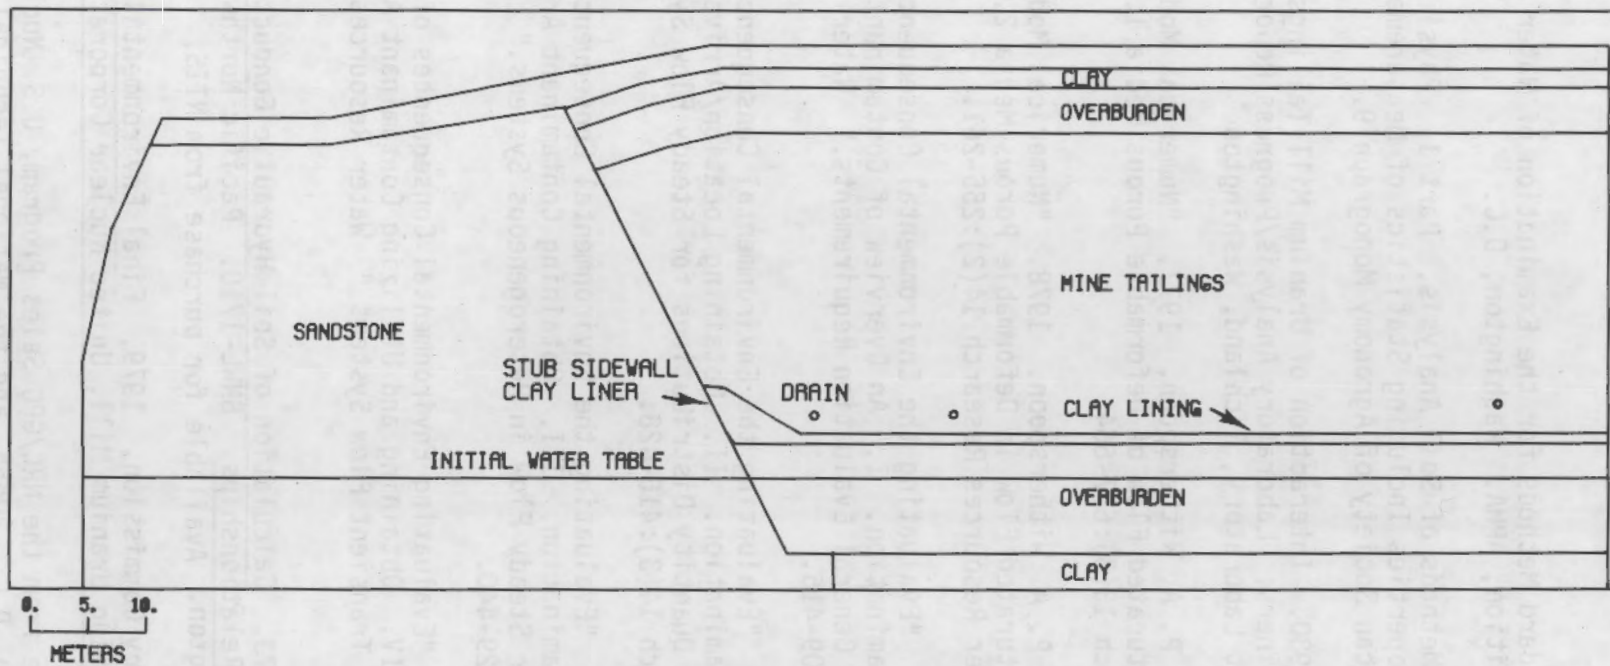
Proposed Control Alternative Utilizing Stub Clay Side Wall Liners and Underdrains to Minimize Contaminant Seepage from Buried Tailings
